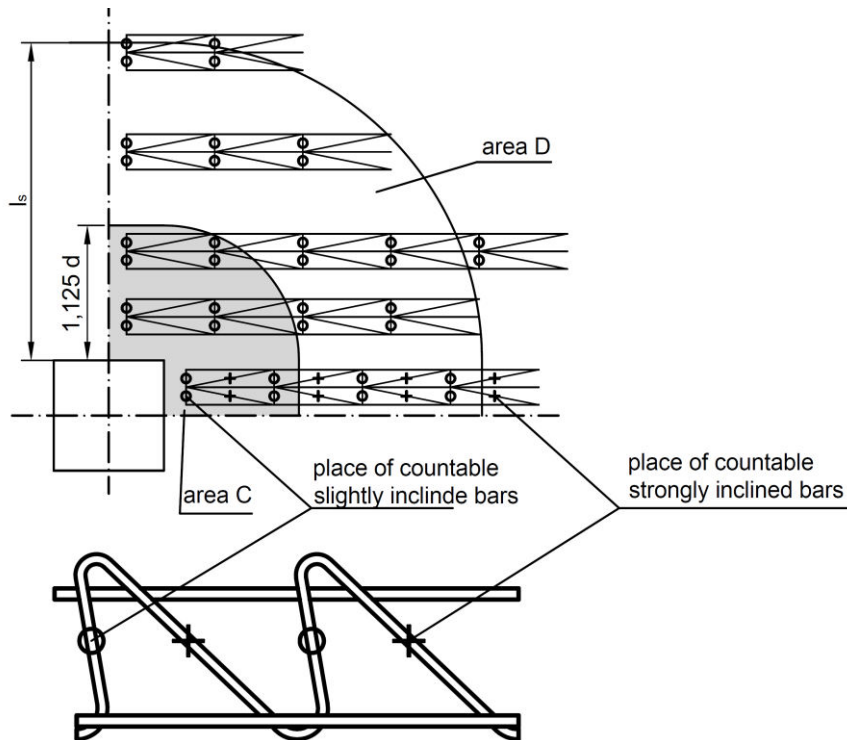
Countable inclined bars of the lattice girder as punching shear reinforcement
